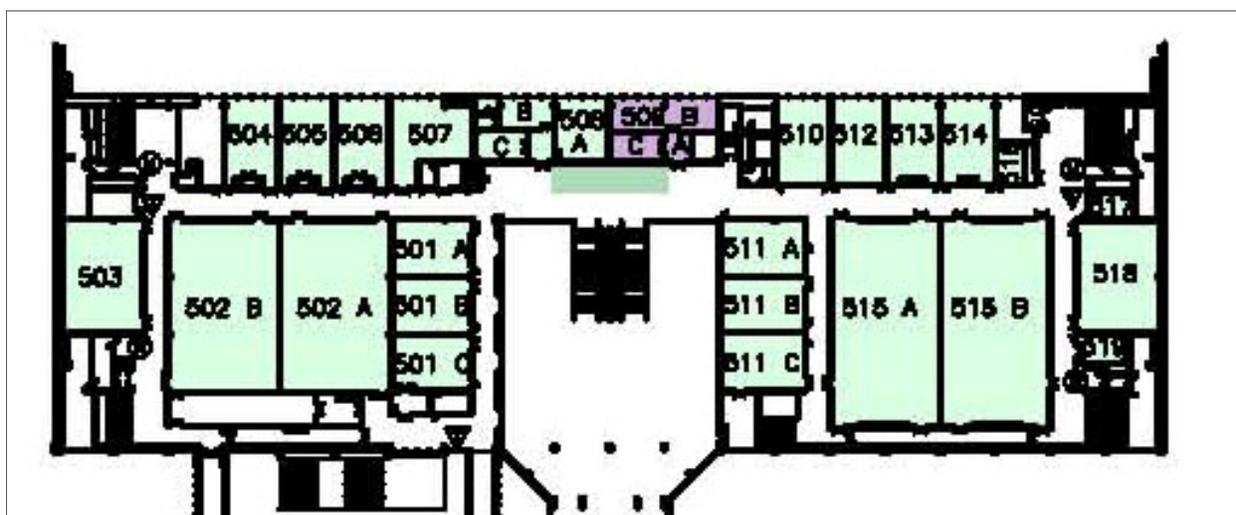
West Hall second floor plan (Los Angeles Convention Center, 2011)
